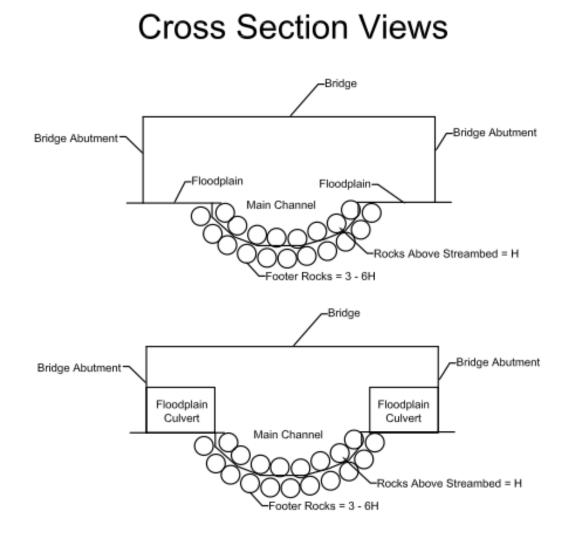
Cross Section Views for Implementing a Restoration Structure Near Bridges. Top Image with Attached Floodplain at Bankfull. Botttom Image with Floodplain Culverts at Bankfull.
